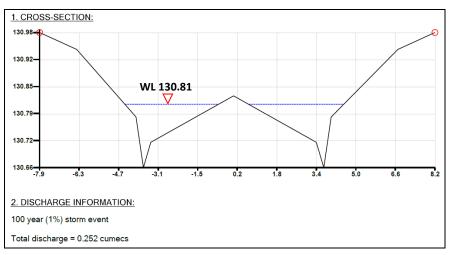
Typical Road Reserve Cross Section (Not to Scale)
